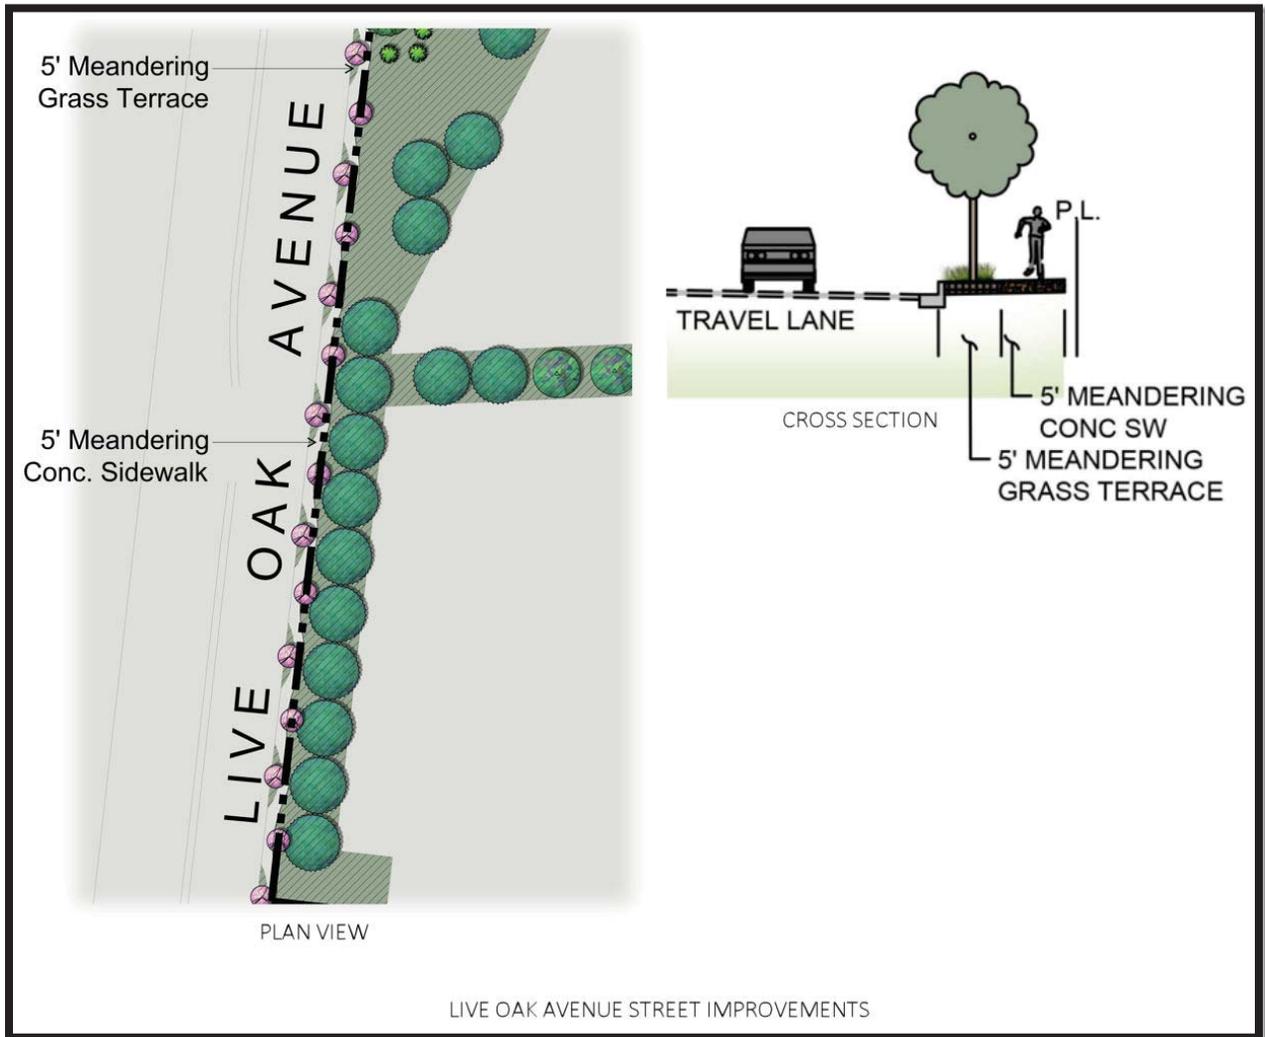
STREET IMPROVEMENTS – LIVE OAK AVENUE
